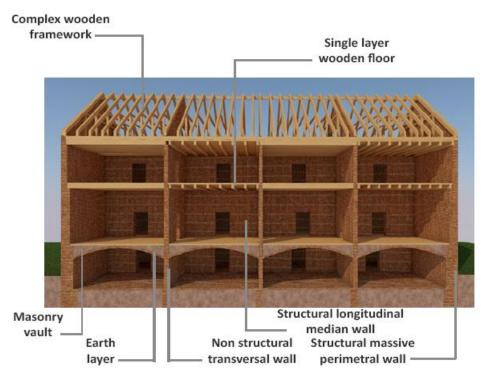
Building typology and structural layer characteristic for historical masonry buildings in Timisoara
